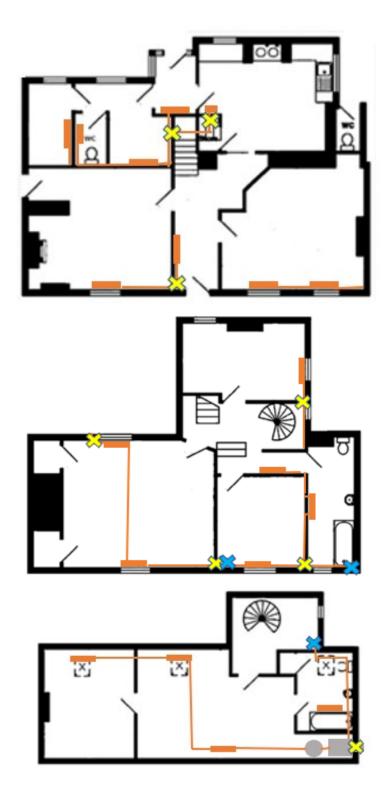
Location of radiators and pipework in (from top) ground, first and attic floors. Yellow crosses indicate pipe runs through original walls. Blue crosses indicate pipe runs going down through floors / ceilings.
